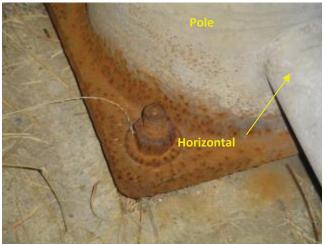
Light corrosion of base plate to pole weld
